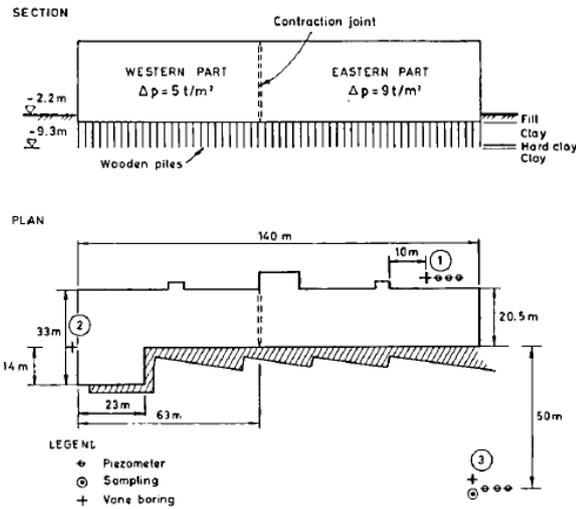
Vertical cross section and plane view of Oslo Jernbanetollsted, From Andersen and Clausen (1975).
